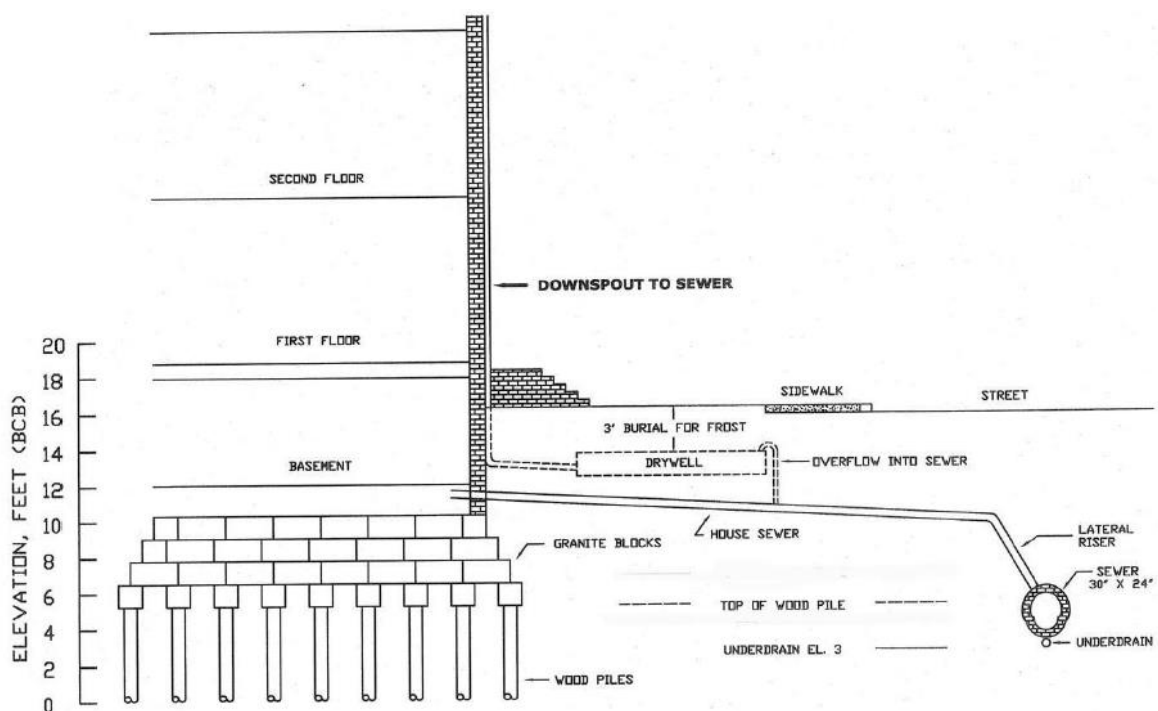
Cross Section of a Building Connected to an Existing Underdrain and Proposed Recharge Drywell (Lambrechts, 2008)
